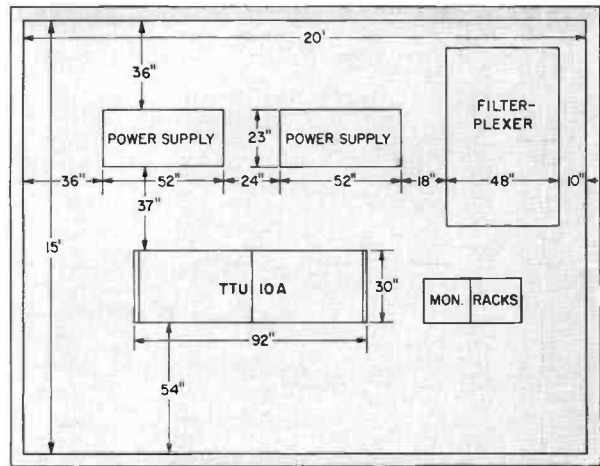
TTU-10A floor plan. The separate power supplies used not be installed in the same room as the transmitter. Silicon-rectifier equipped, these may be installed in a basement, attic, closet or other location.
